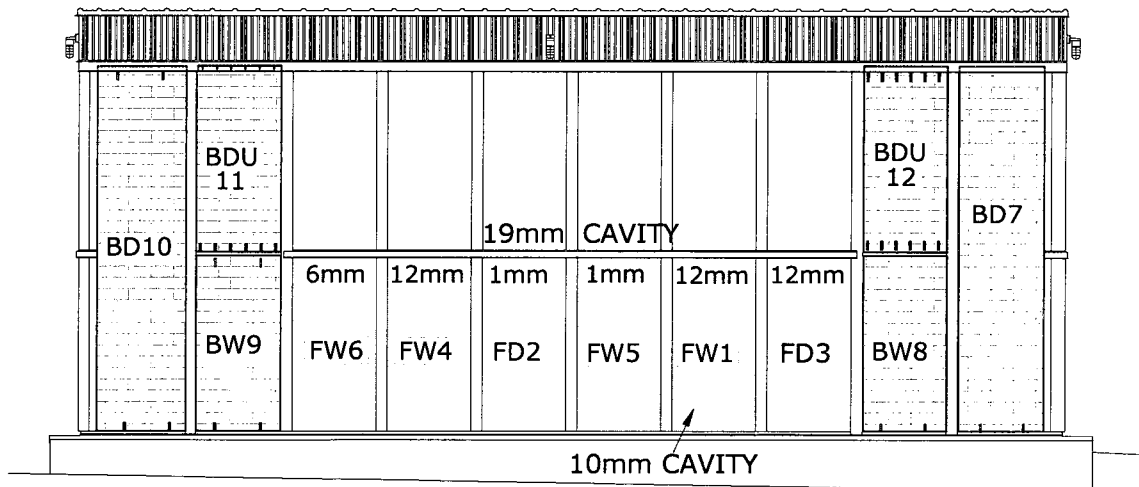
Location of test walls on the southeast facade of the test facility.
